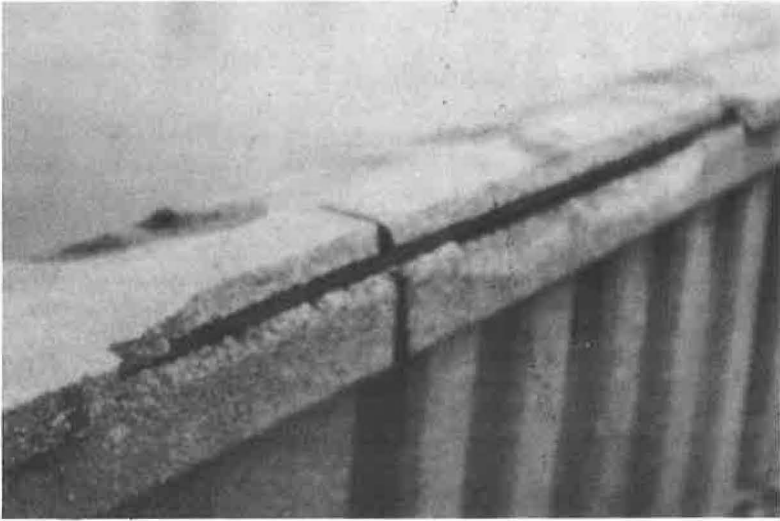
Sidewalk railing before repair, 112th St. Bridge, Troy.
